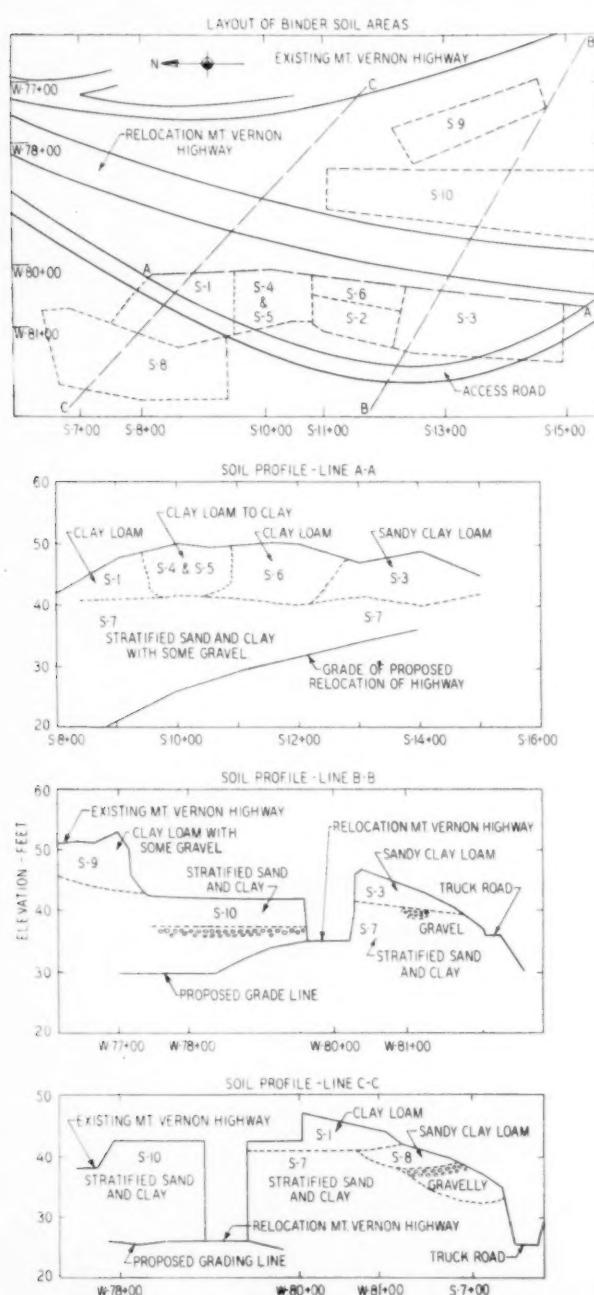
LAYOUT AND SOIL PROFILES OF BINDER SOIL PIT AT ROACHES RUN.
